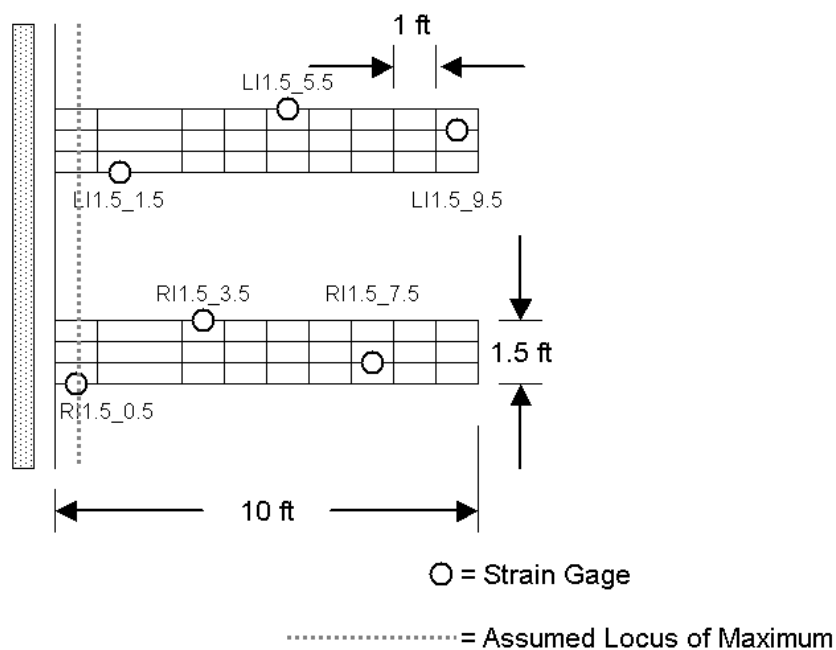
Plan view of instrumented intermediate bar mat IL1.5 at level 1.5 located in the intermediate and primary reinforced section.
